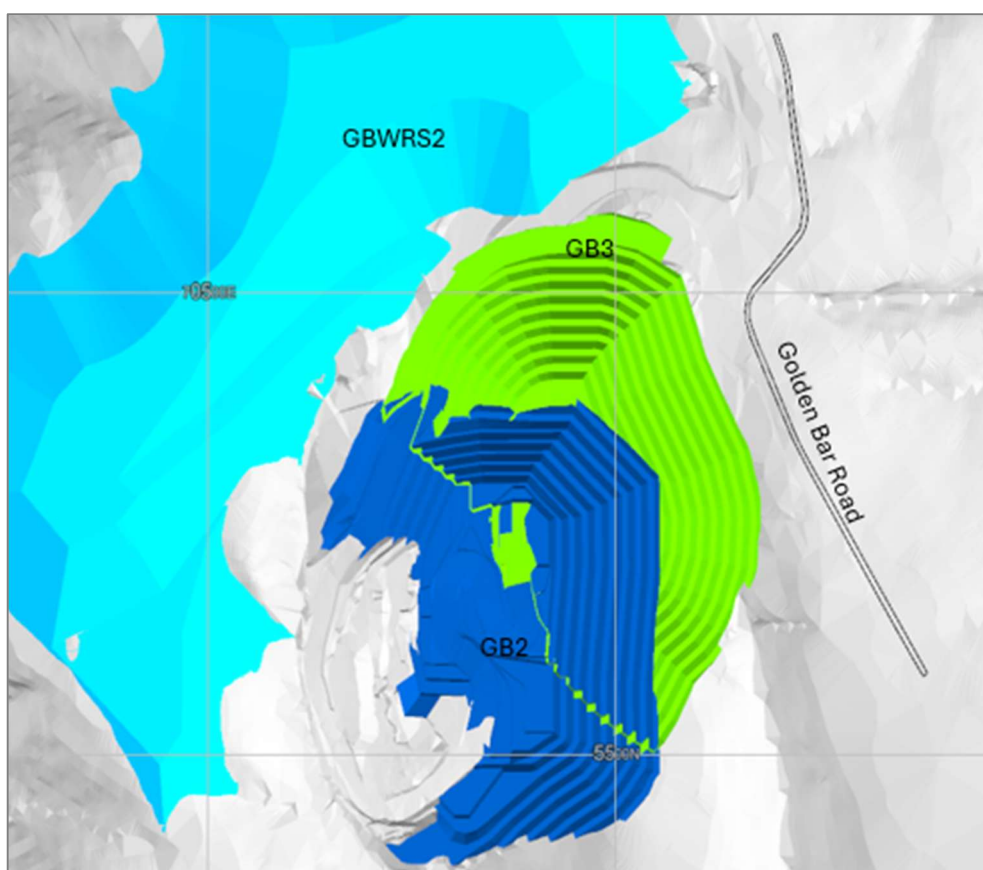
Plan of proposed Golden Bar Stages 2 and 3 expansions.
